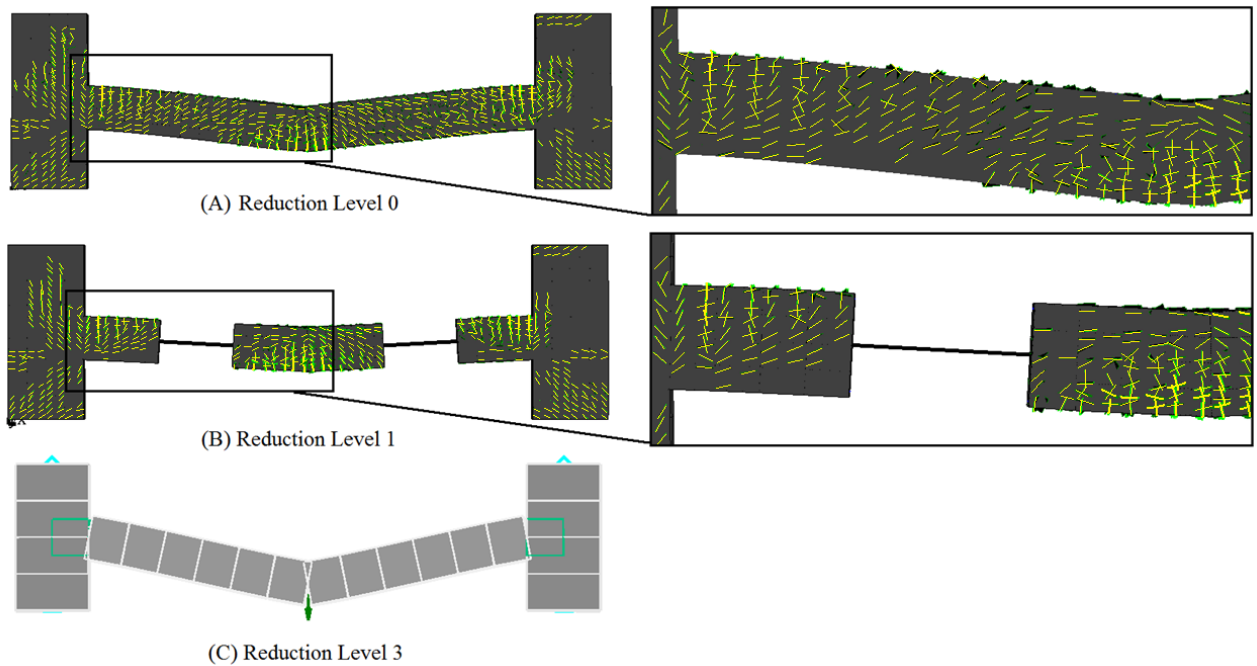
RC BEAM SUPPORTED ON TWO SHEAR WALLS. CRACK PATTERNS AND DEFORMED SHAPES PRIOR TO FAILURE.
